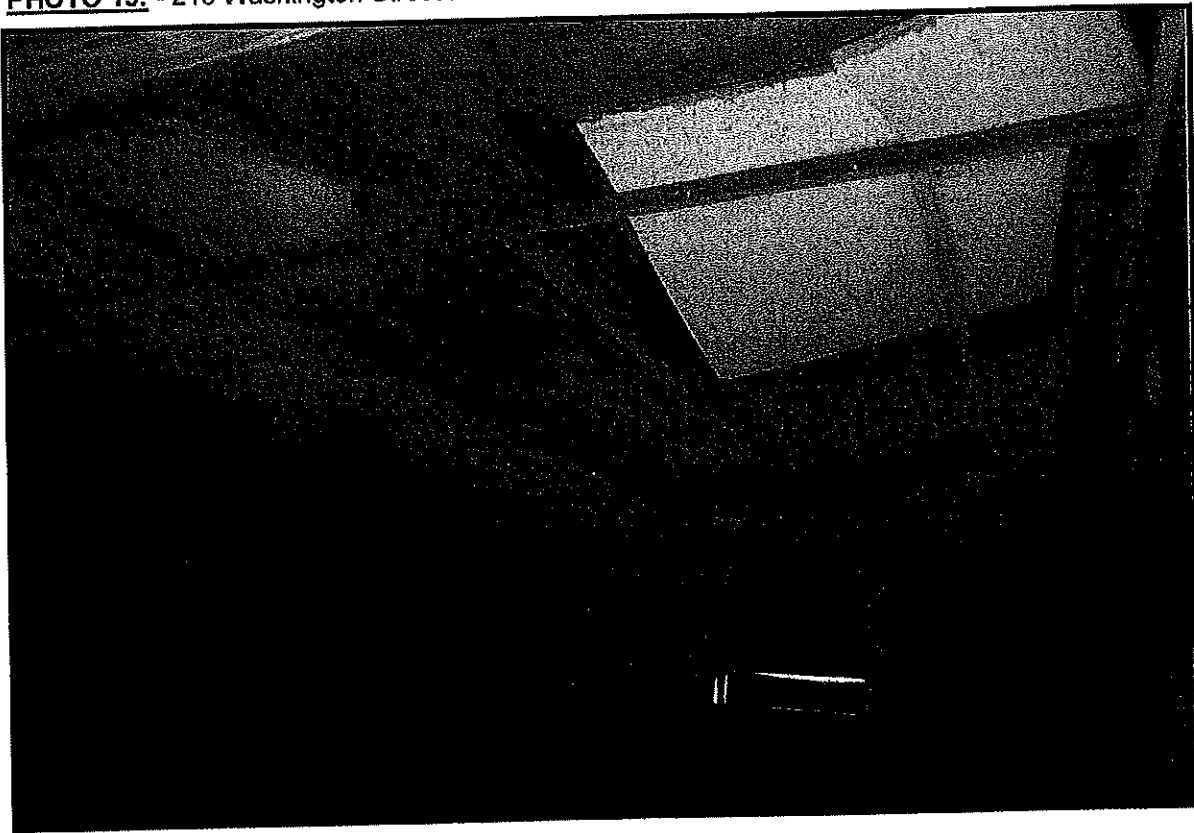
216 Washington Street Interior Ceiling Damage.
